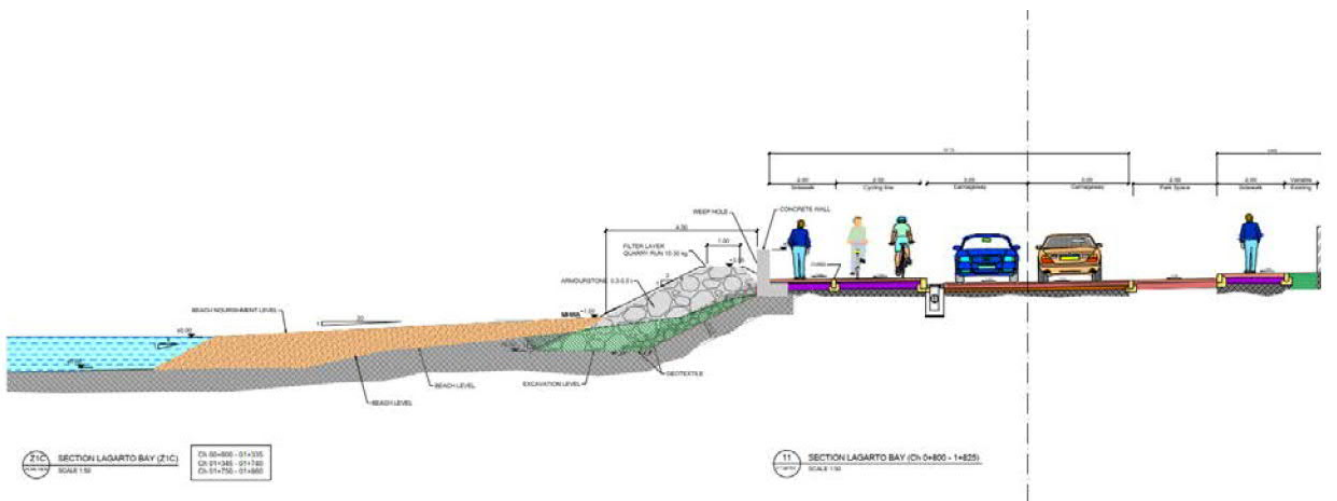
Lagarto Bay Detailed design layout and typical cross section. Rock revetment and sand nourishment are shown in the figures above
